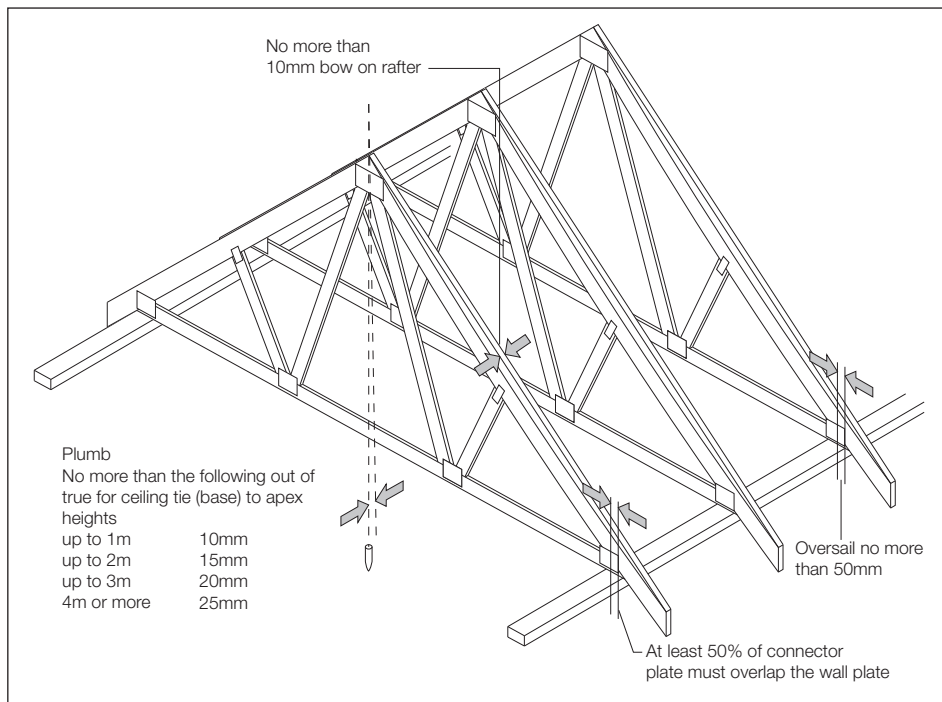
Typical trussed rafter roof showing tolerances
